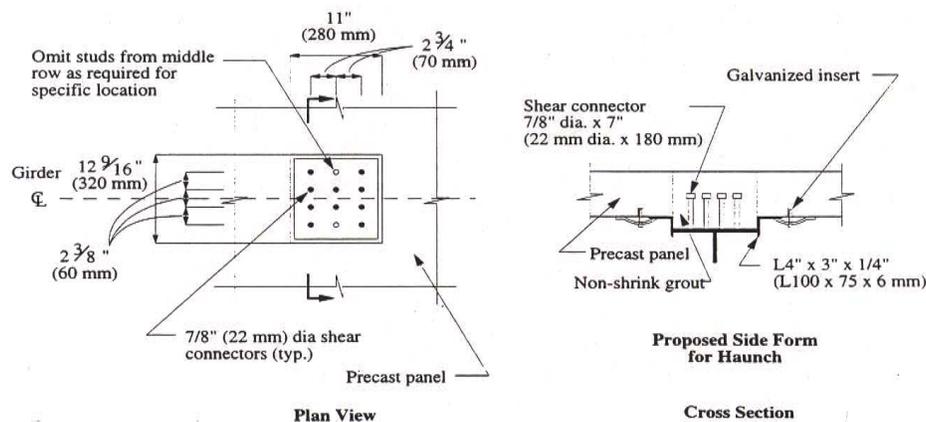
Details of the panel-to-girder connection used on Queen Elizabeth Way-Welland River Bridge, Ontario, Canada¹²
